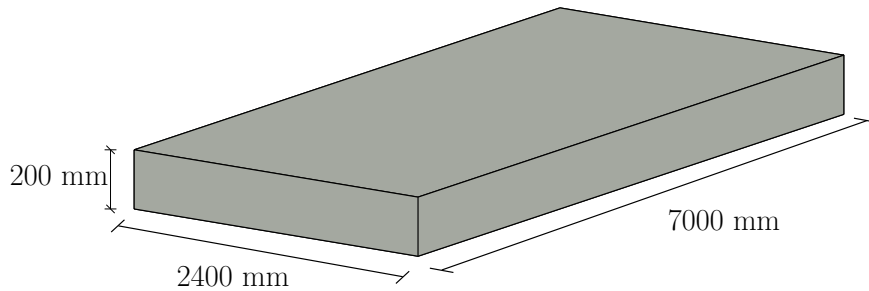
Visualisation of the concrete floor panel used as reference case.
